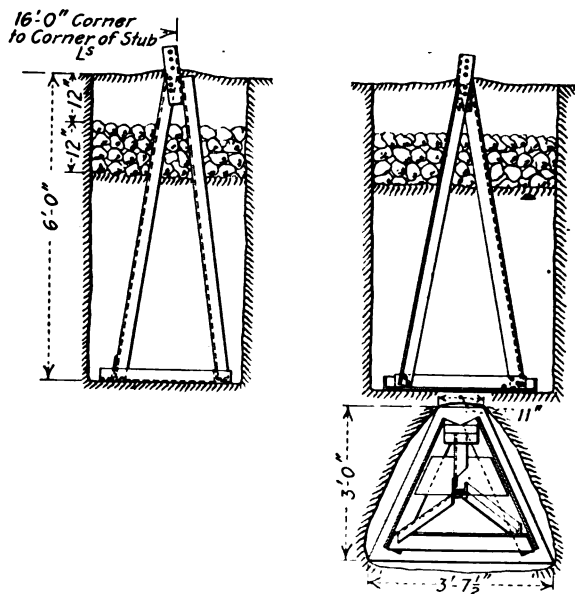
PENNSYLVANIA WATER AND POWER CO. FOUNDATION FOR 40-FT. LIGHT SECTION TOWERS
